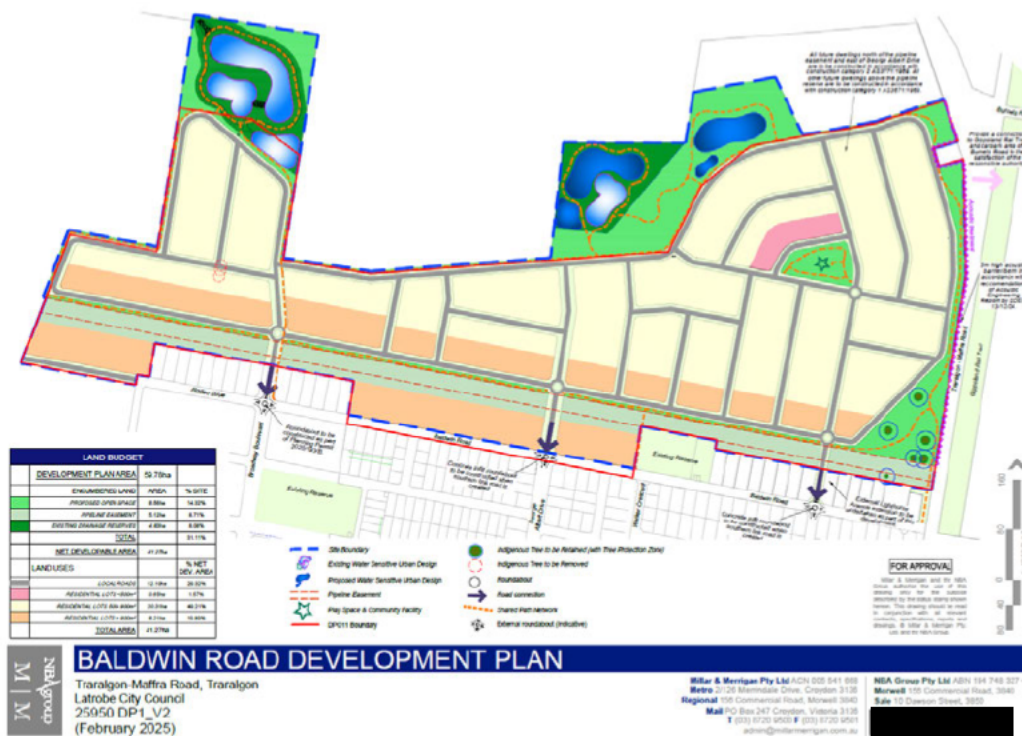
BALDWIN ROAD DEVELOPMENT PLAN
